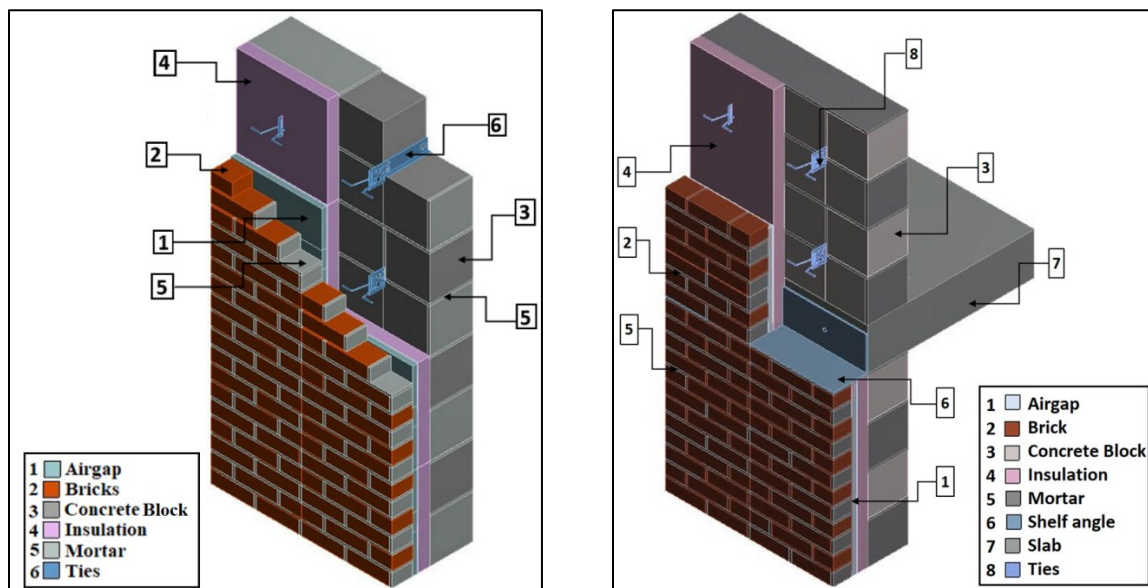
Two common concrete masonry cavity wall configurations and their typical components (clear wall and intermediate floor intersection respectively)
